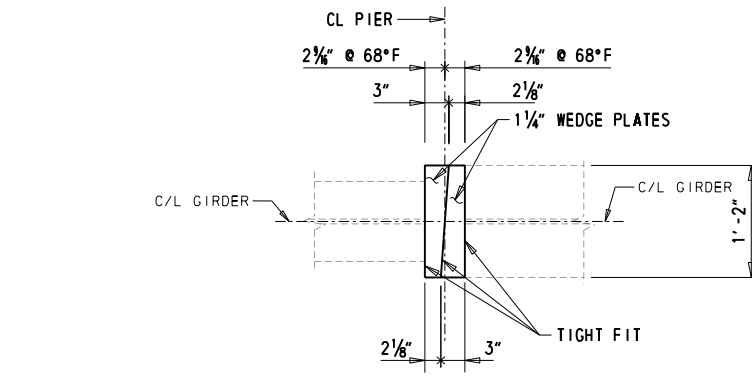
DETAIL-RETROFIT OF EXISTING INTERIOR DIAPHRAGM CONNECTION
